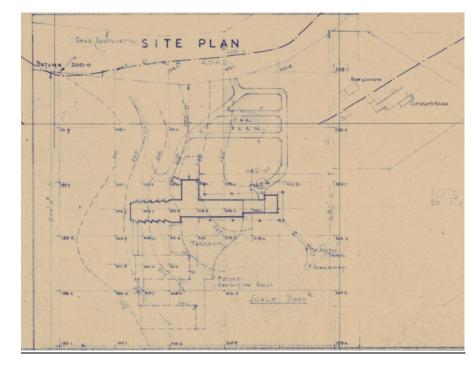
Uganda Museum, drawing no.6., detail: a schematic sketch of the site plan, 1951, Ernst May (Architekturmuseum der TU München)
